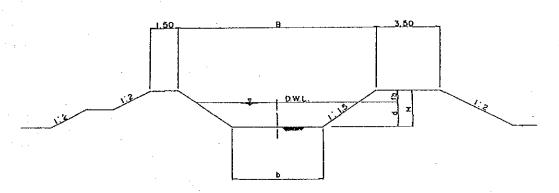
Typical Cross Section of Proposed Secondary and Sub-secondary Canals
